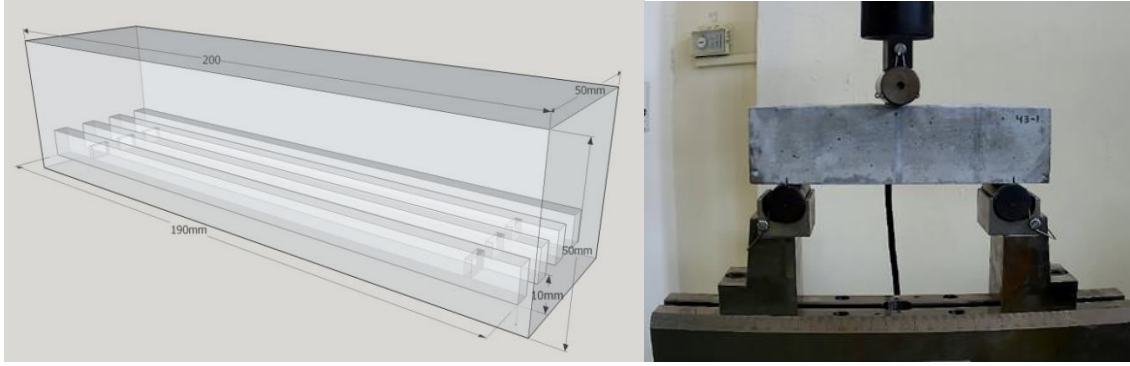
Schematic of printed reinforcement in mortar prism(left) and center point bending test setup (right).
